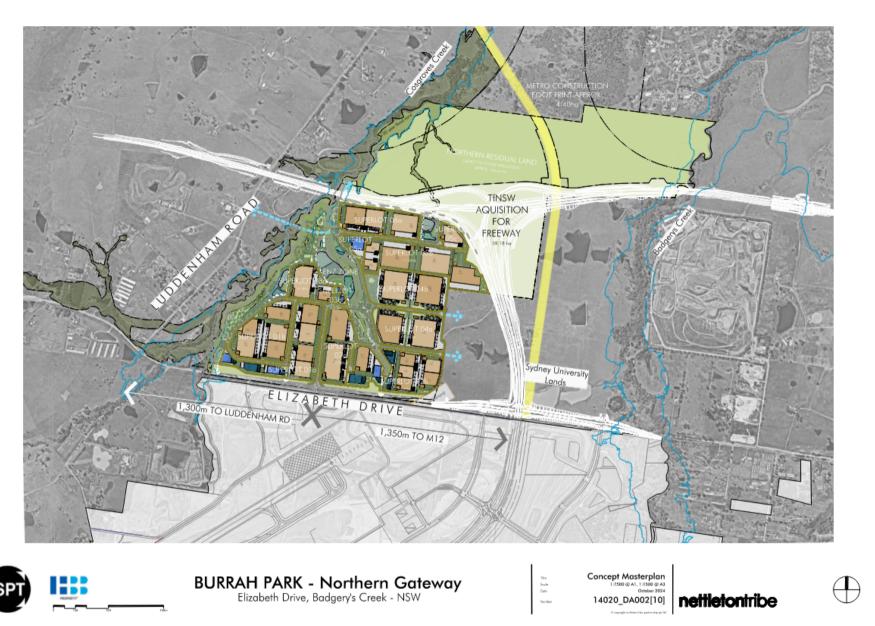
Site plan showing layout of lots across the entire Concept Plan (the site)
